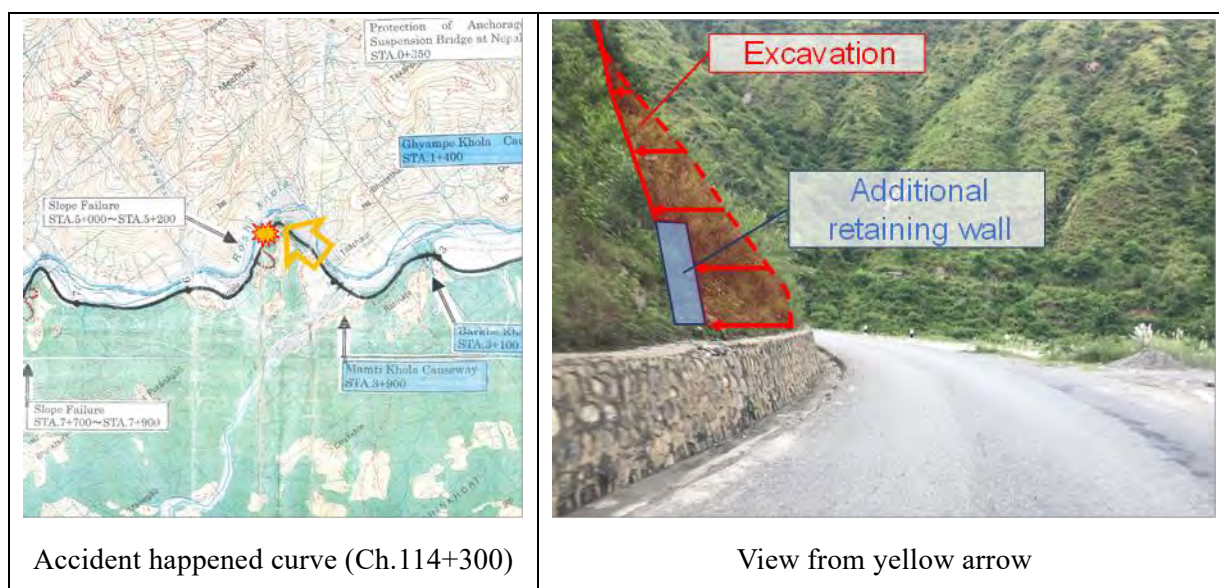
Example of Recommended Site for Additional Sight Distance Improvement
